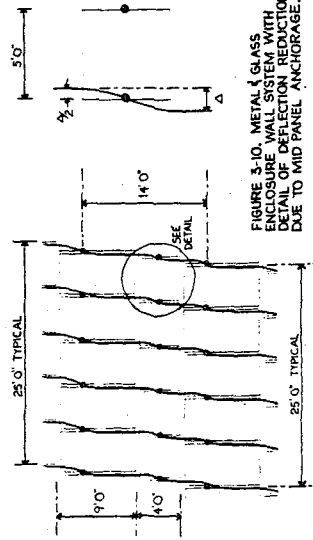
METAL GLASS ENCLOSURE WALL SYSTEM WITH DETAIL OF DEFLECTION REACTION DUE TO MID-PANEL ANCHORAGE.
